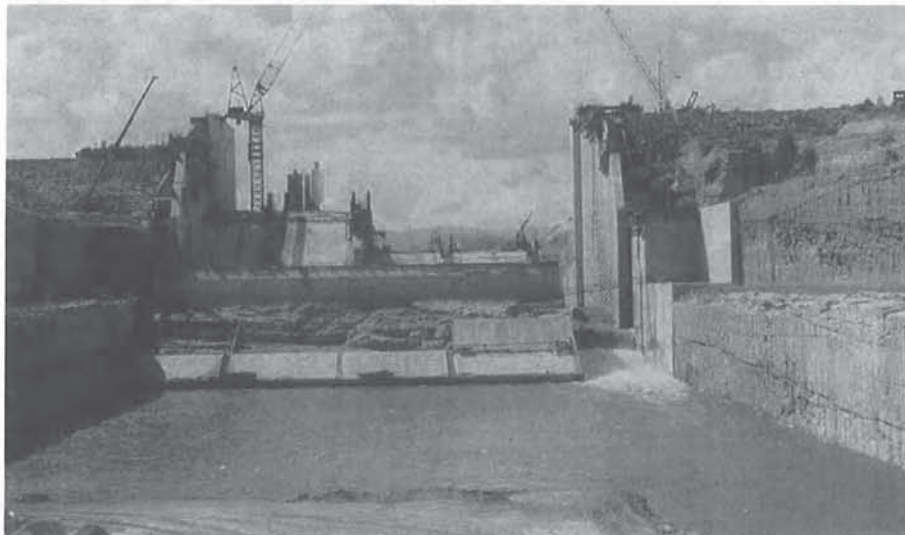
Wivenhoe Outlet and Spillway Plunge Pool Construction
